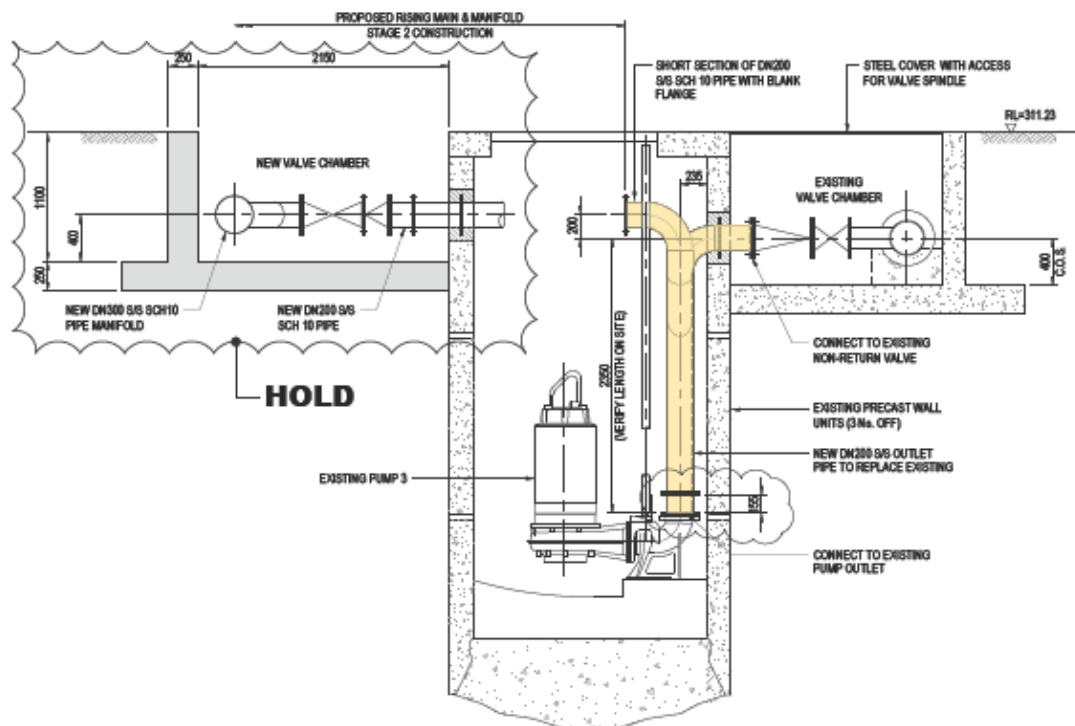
Elevation view of the new risers (orange shaded) with an additional blanked-off take-off to a future valve pit and manifold
